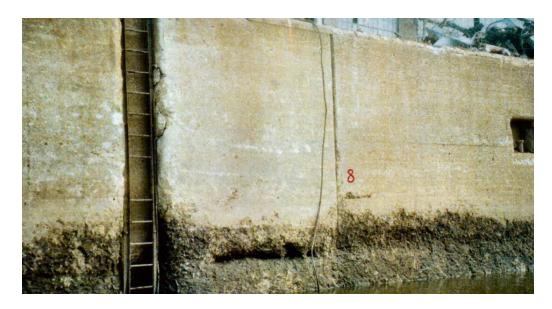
Spalling on the concrete bulkhead is surficial and does not indicate a structural problem. Photograph by Mueser Rutledge Consulting Engineers.
